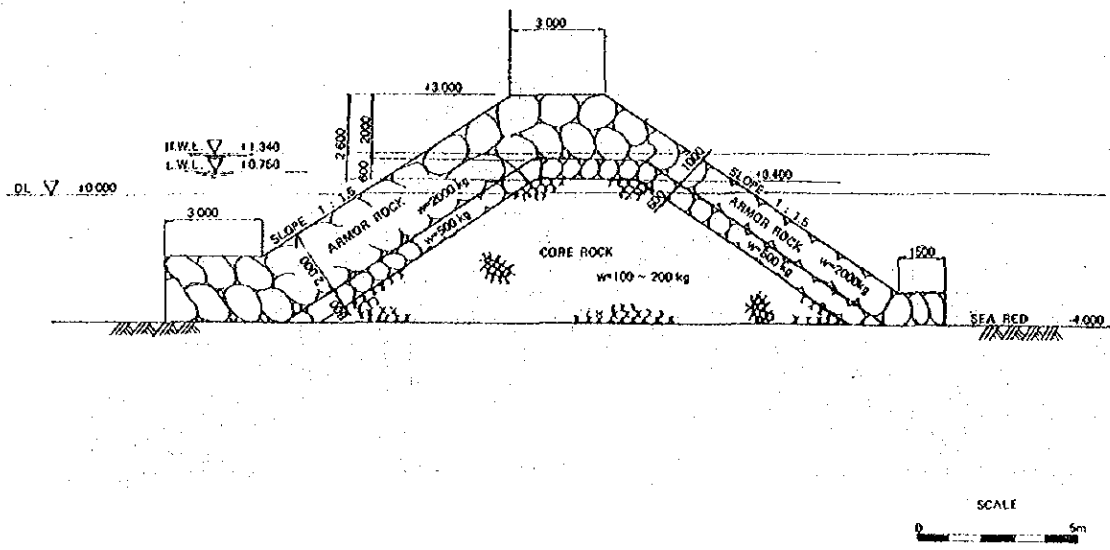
Cross Section of Breakwater (1) – Iloilo Port
